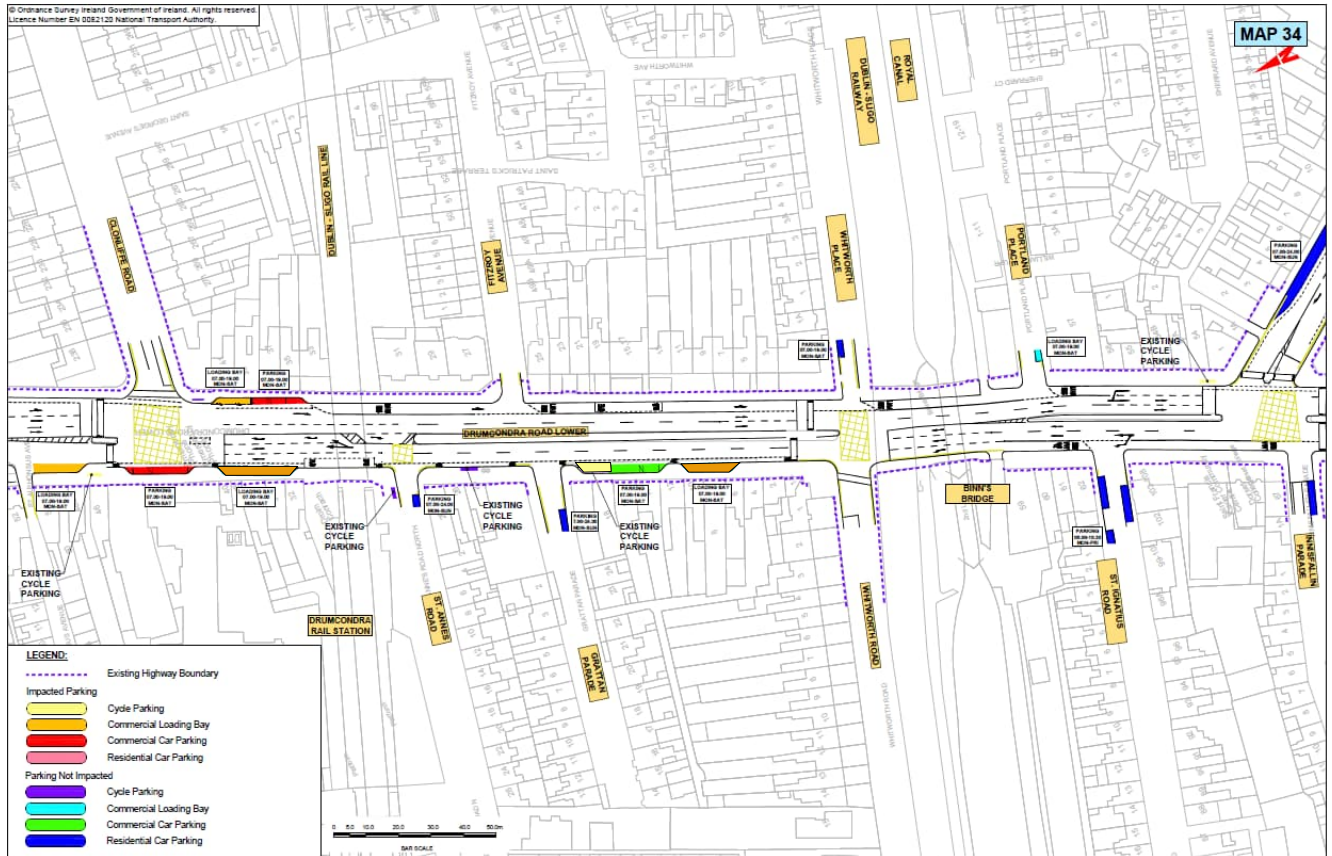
Lower Drumcondra Road / Alphonsus Avenue to Whitworth Road
